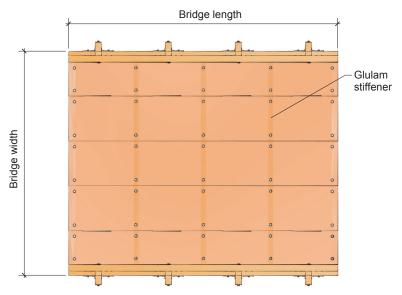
Longitudinal glulam deck plan square. Stiffeners run perpendicular to deck panels.
